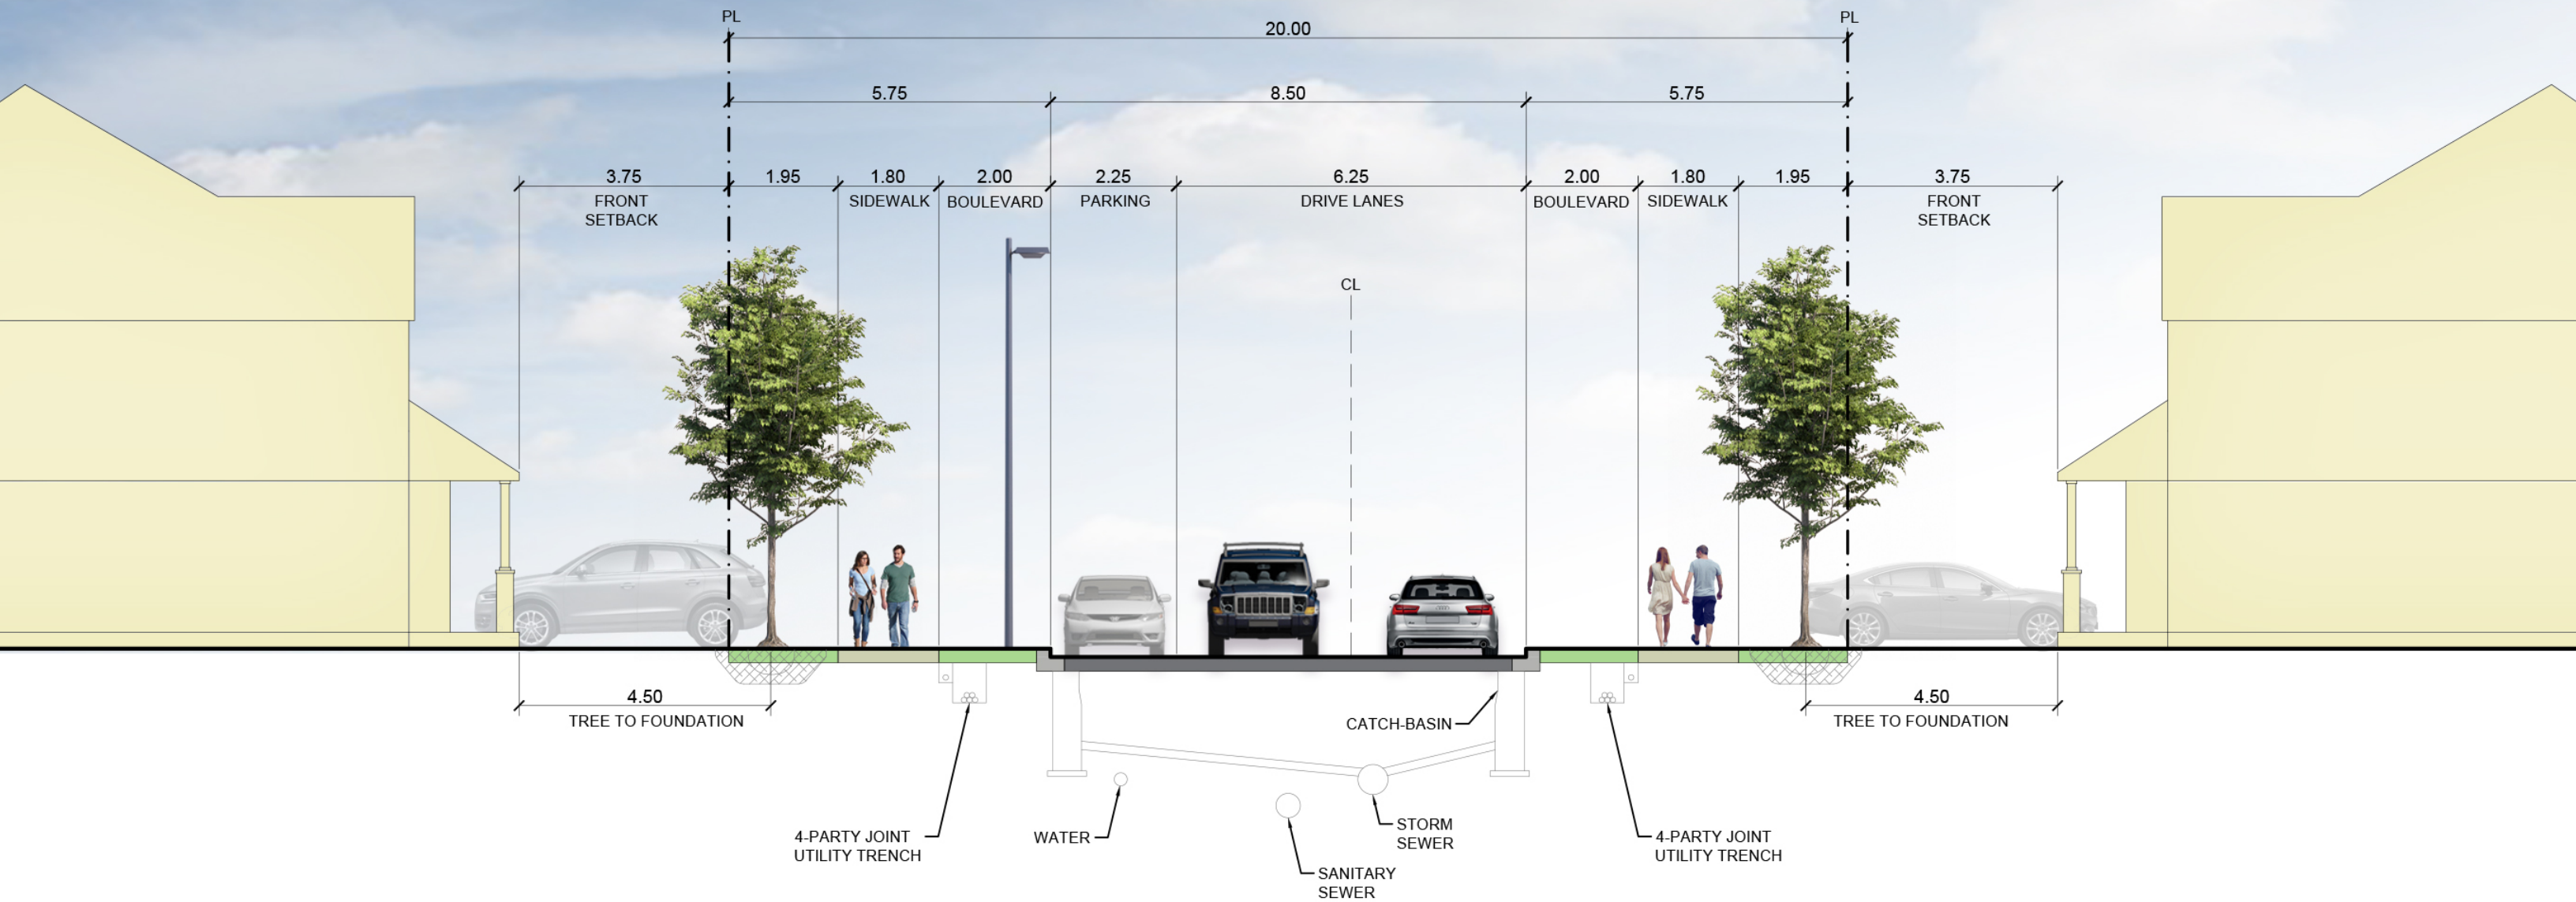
Local Road (Typical 20.0m Right-of-Way) Cross Section
